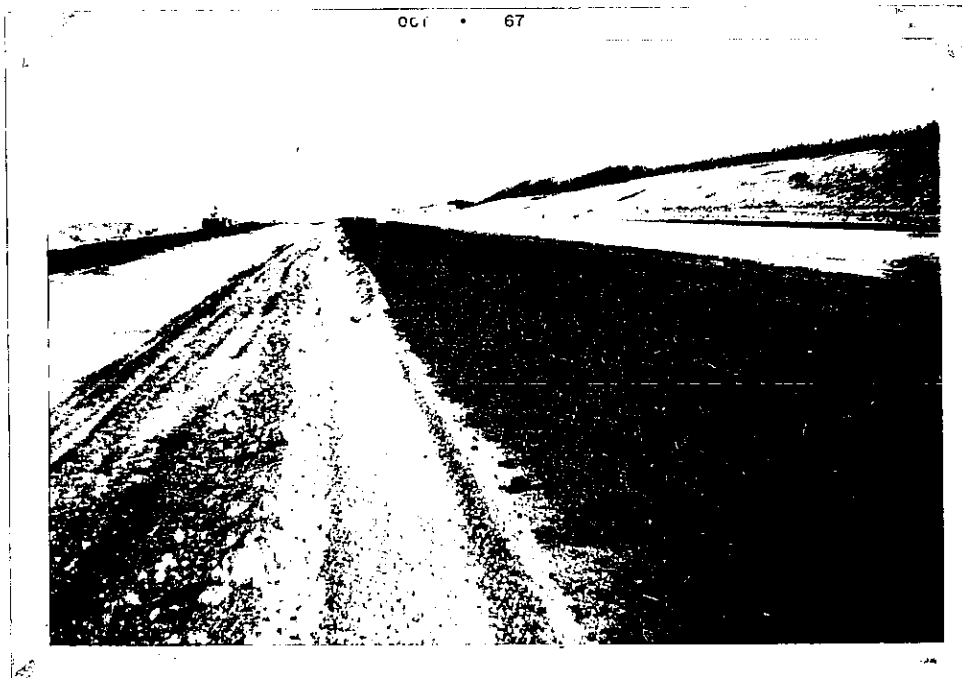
Topsoil windrow on the shoulder was bladed onto the shoulder berm.
